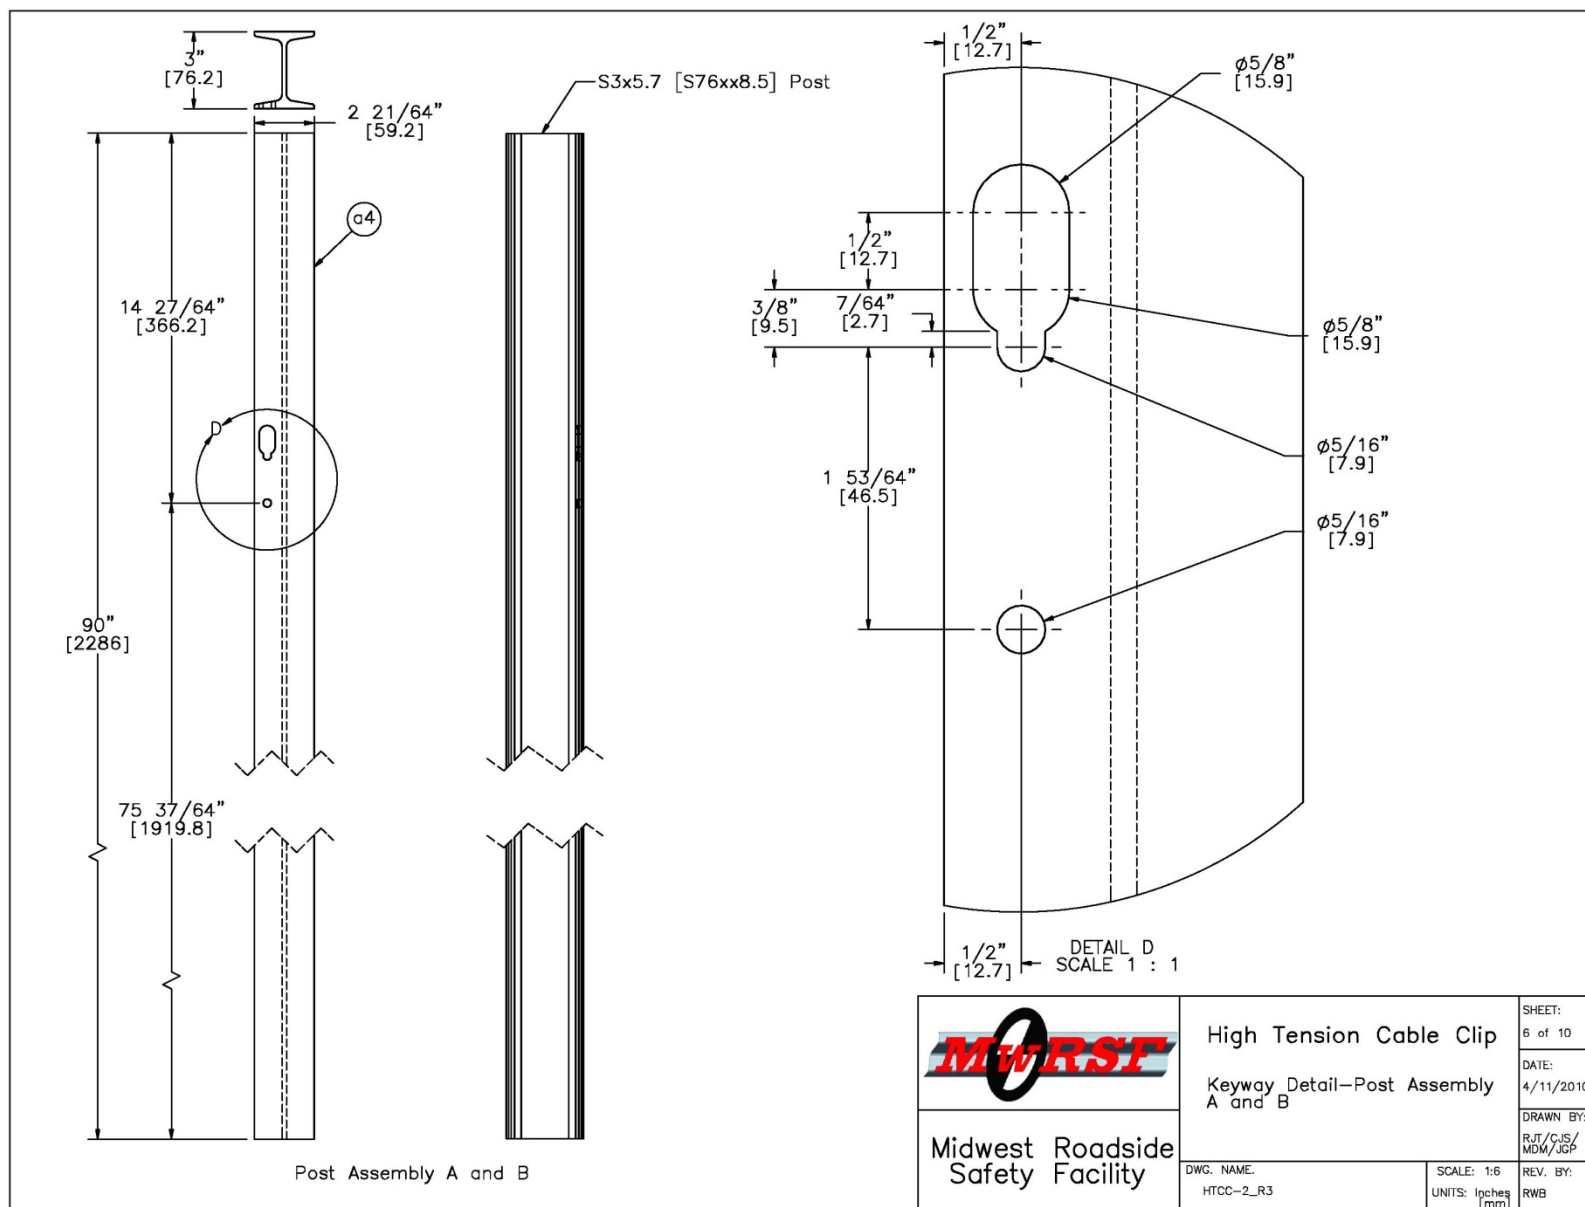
Keyway Detail, Post Assembly A and B, Test No. HTCC-2
